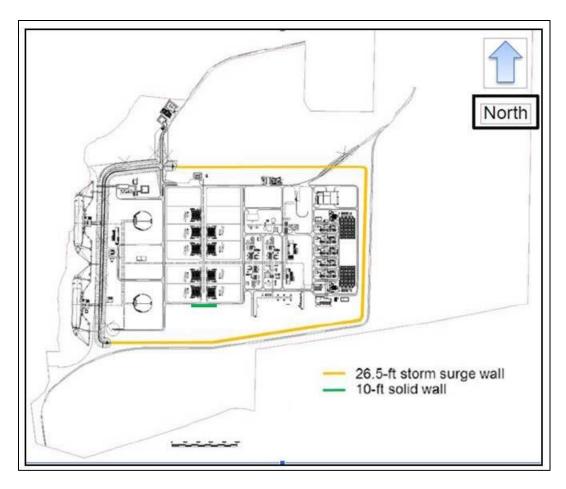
26.5 Foot High Storm Surge Wall Surrounding the Terminal to the North, East, and South (*The thin outer line is the property line*)
